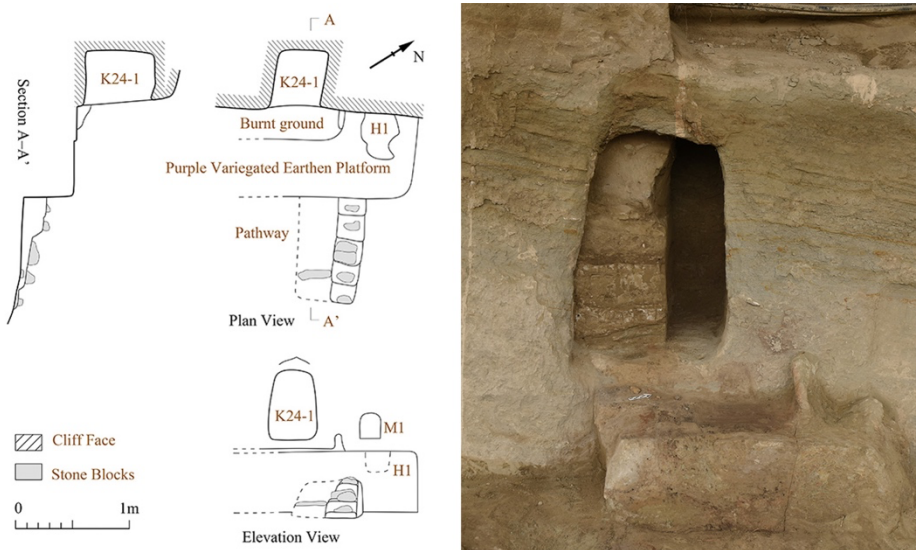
Plan, elevation, and section of K24-1(left) and exterior elevation of K24-1 (right) (viewed from southeast to northwest).
